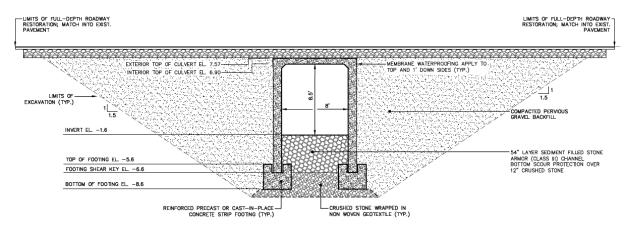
Alternative 2: 8 foot wide by 8.5 foot high open bottom culvert.
